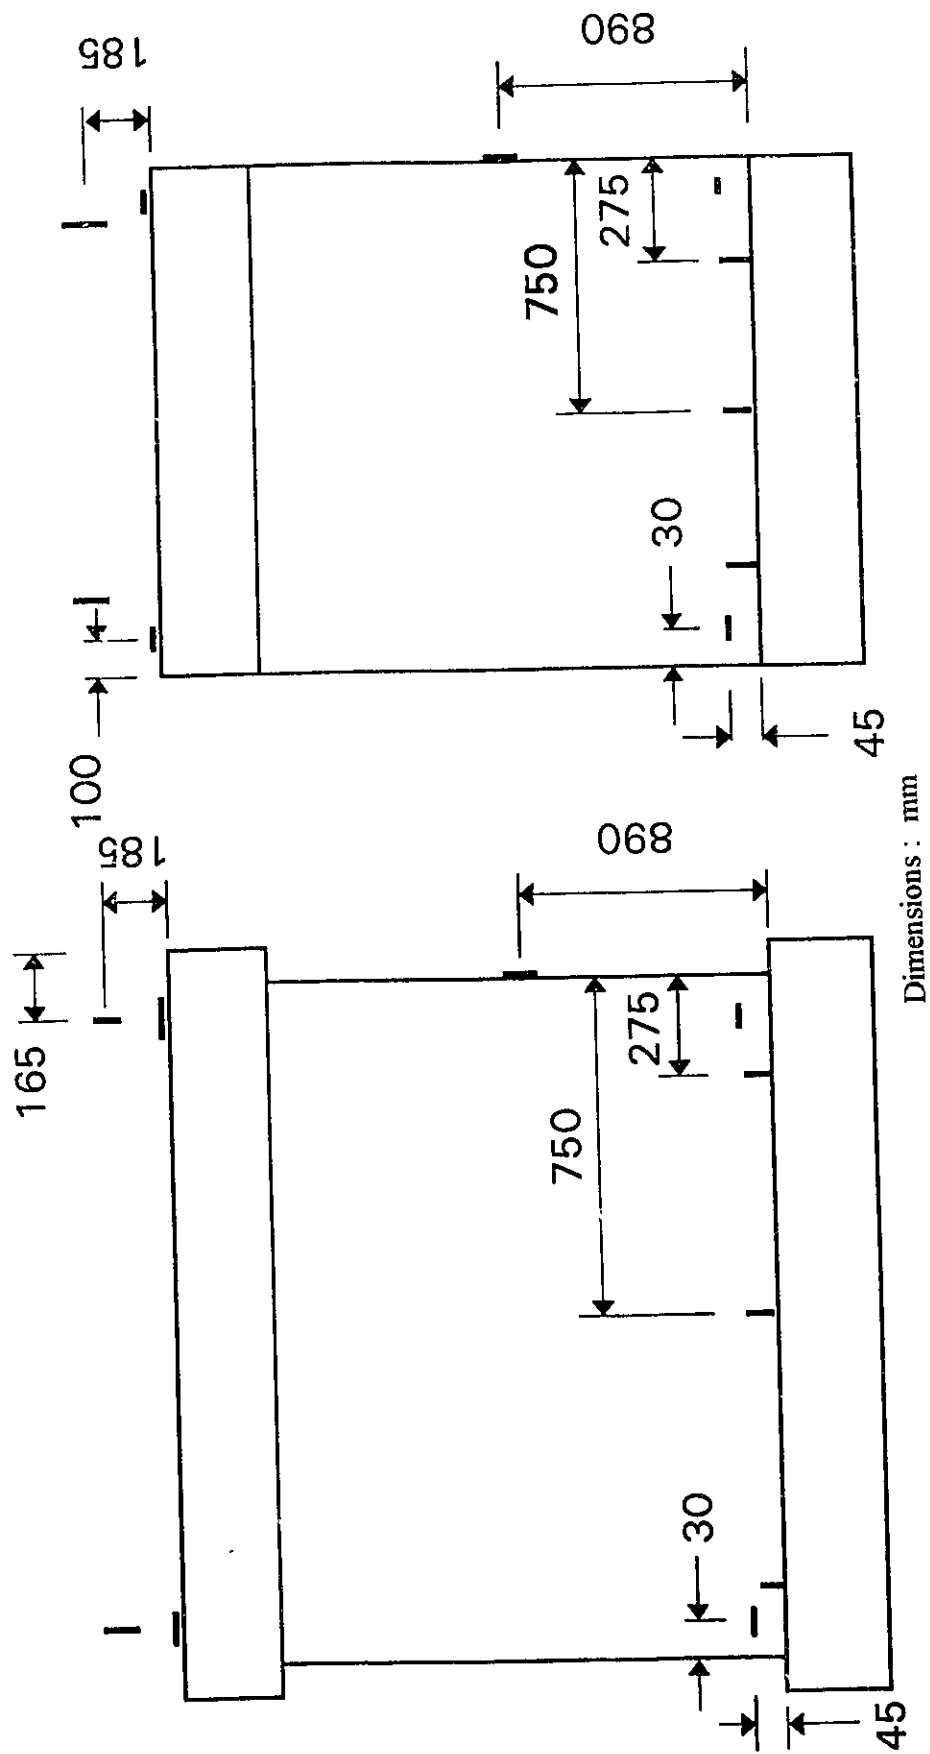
Locations of Targets for Potentiometers and LVDT's on Wall 7 (left) and on Wall 8 (right)
